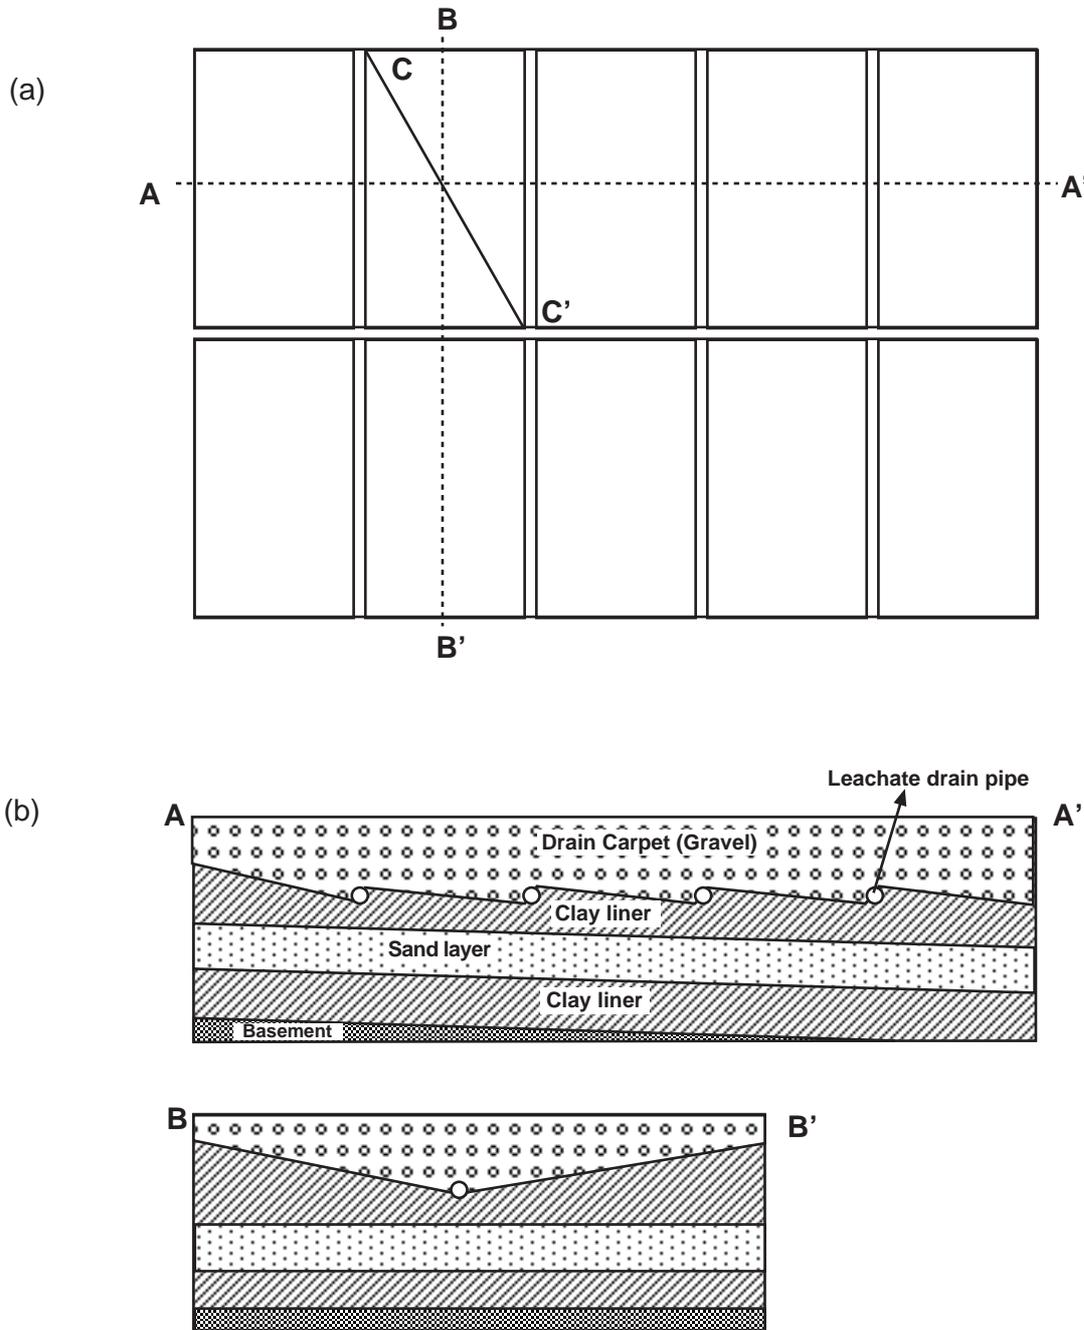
Proposed model of landfill site: (a) Plan view, (b) Cross-sections through A–A' and B–B'
